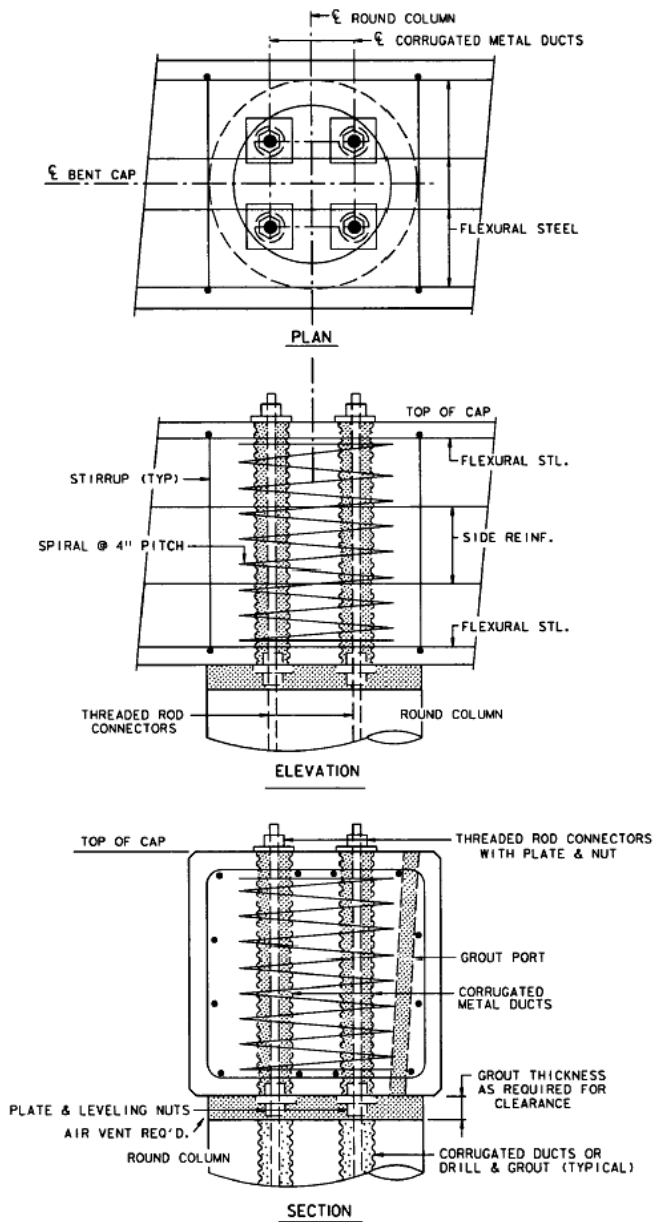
Connection Detail for Bolted Connection on Column (Surface-flush Option with Plate-and-Leveling Nut Option) [2.1]
